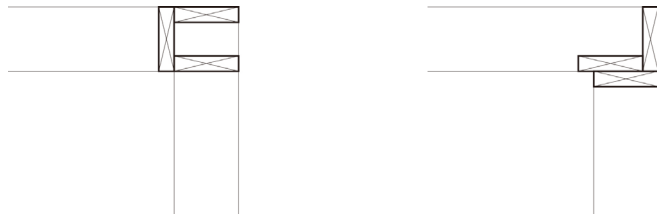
Plan of corner studs, drawn by author (Ching, 2014)
